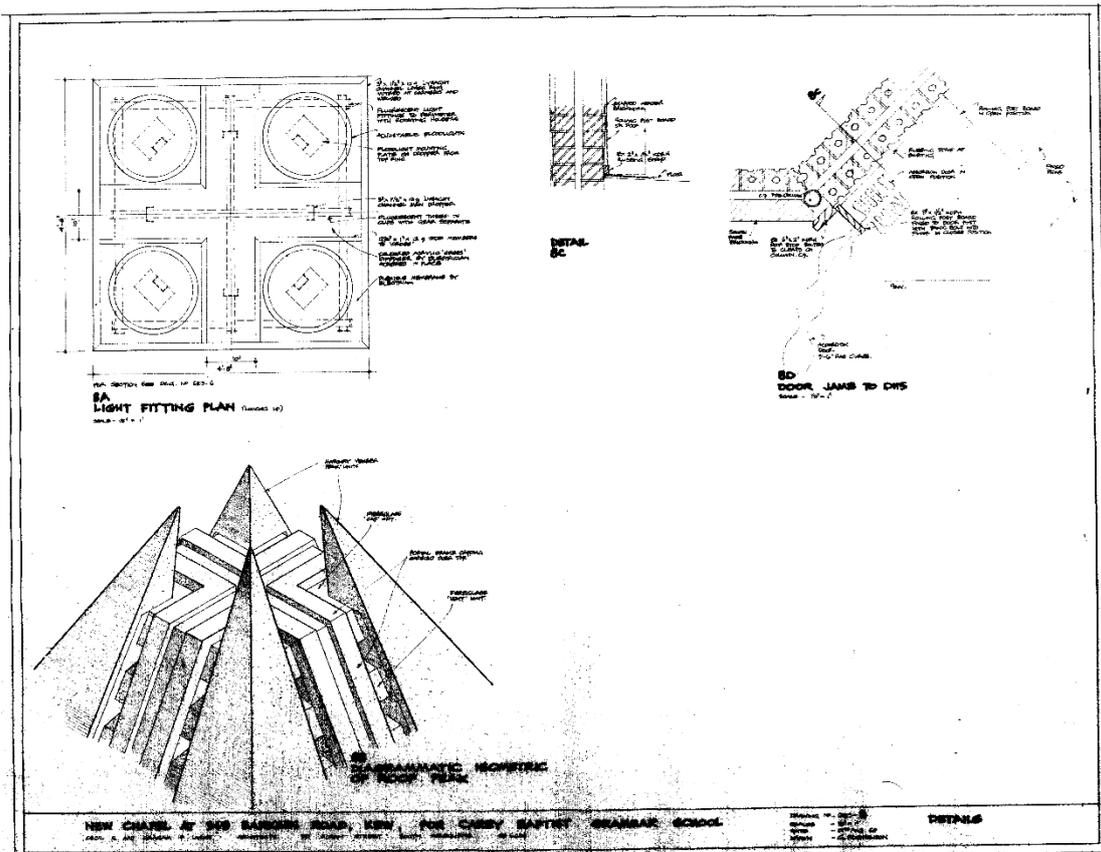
Roof peak and lighting details for 'The William Carey Chapel'. (Source: Building Permit 1563)
